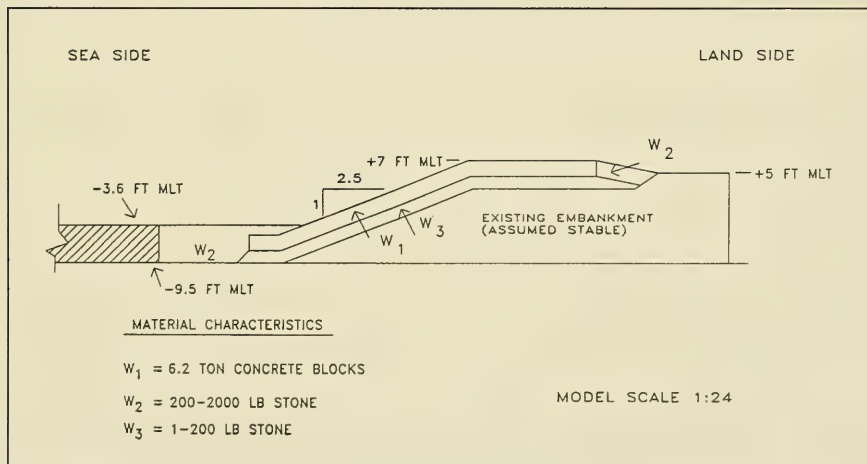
Concrete block revetment cross section, Plans 5 and 5R
